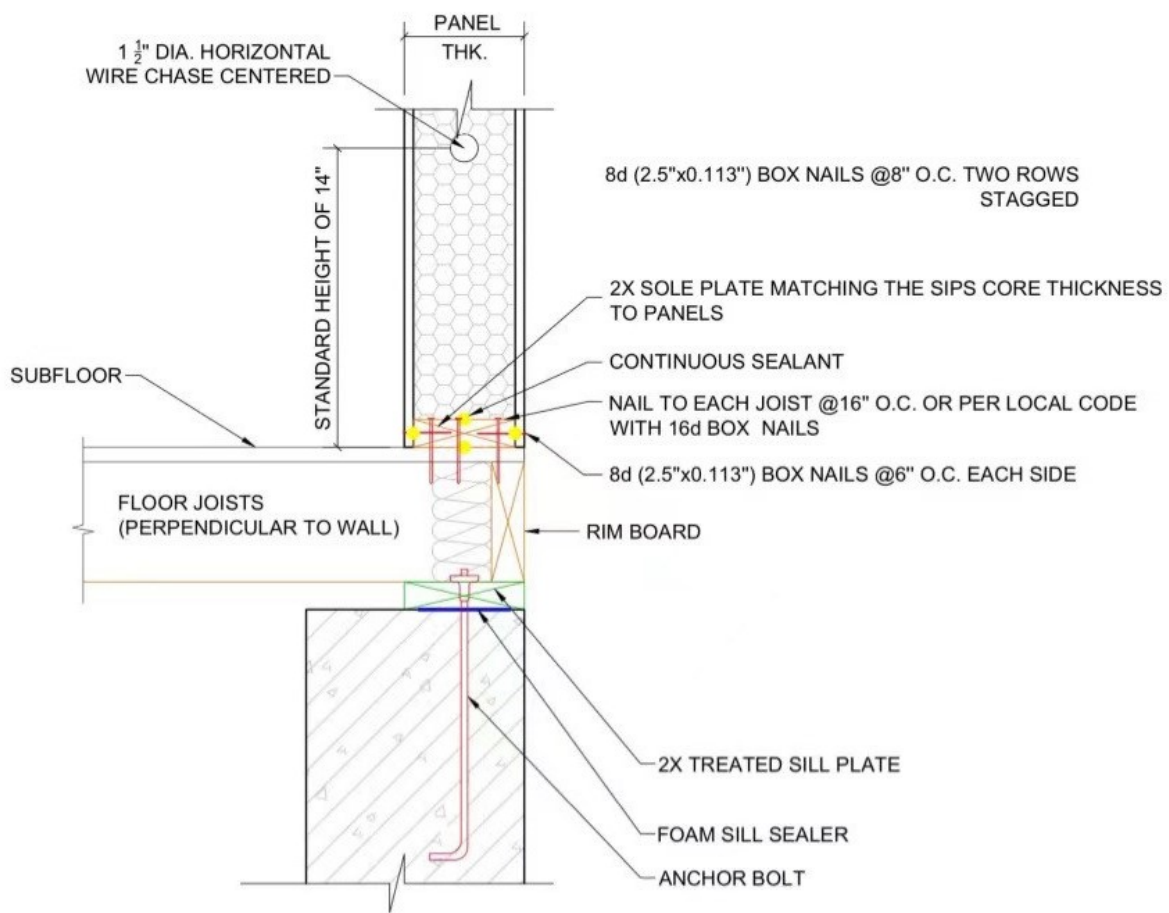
TYPICAL WALL PANEL ON FLOOR
